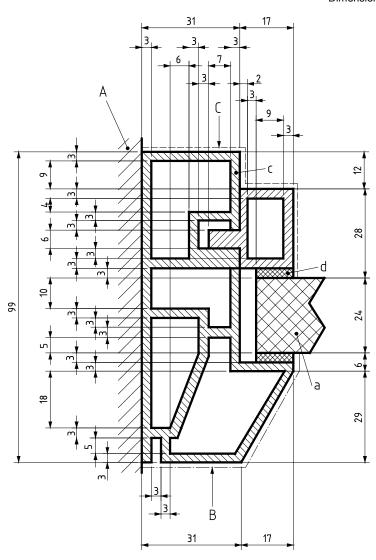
Fixed frame section and insulation panel (b_{f} = 48 mm)
